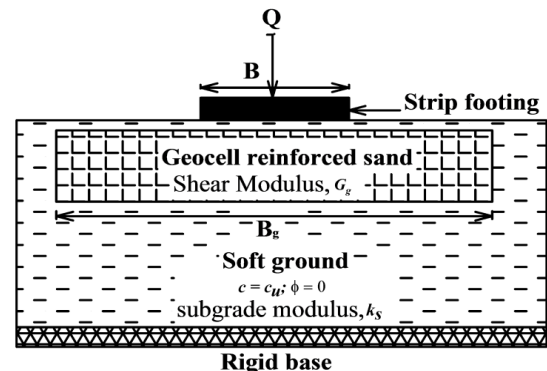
Definition sketch of strip footing on geocell reinforced foundation bed
